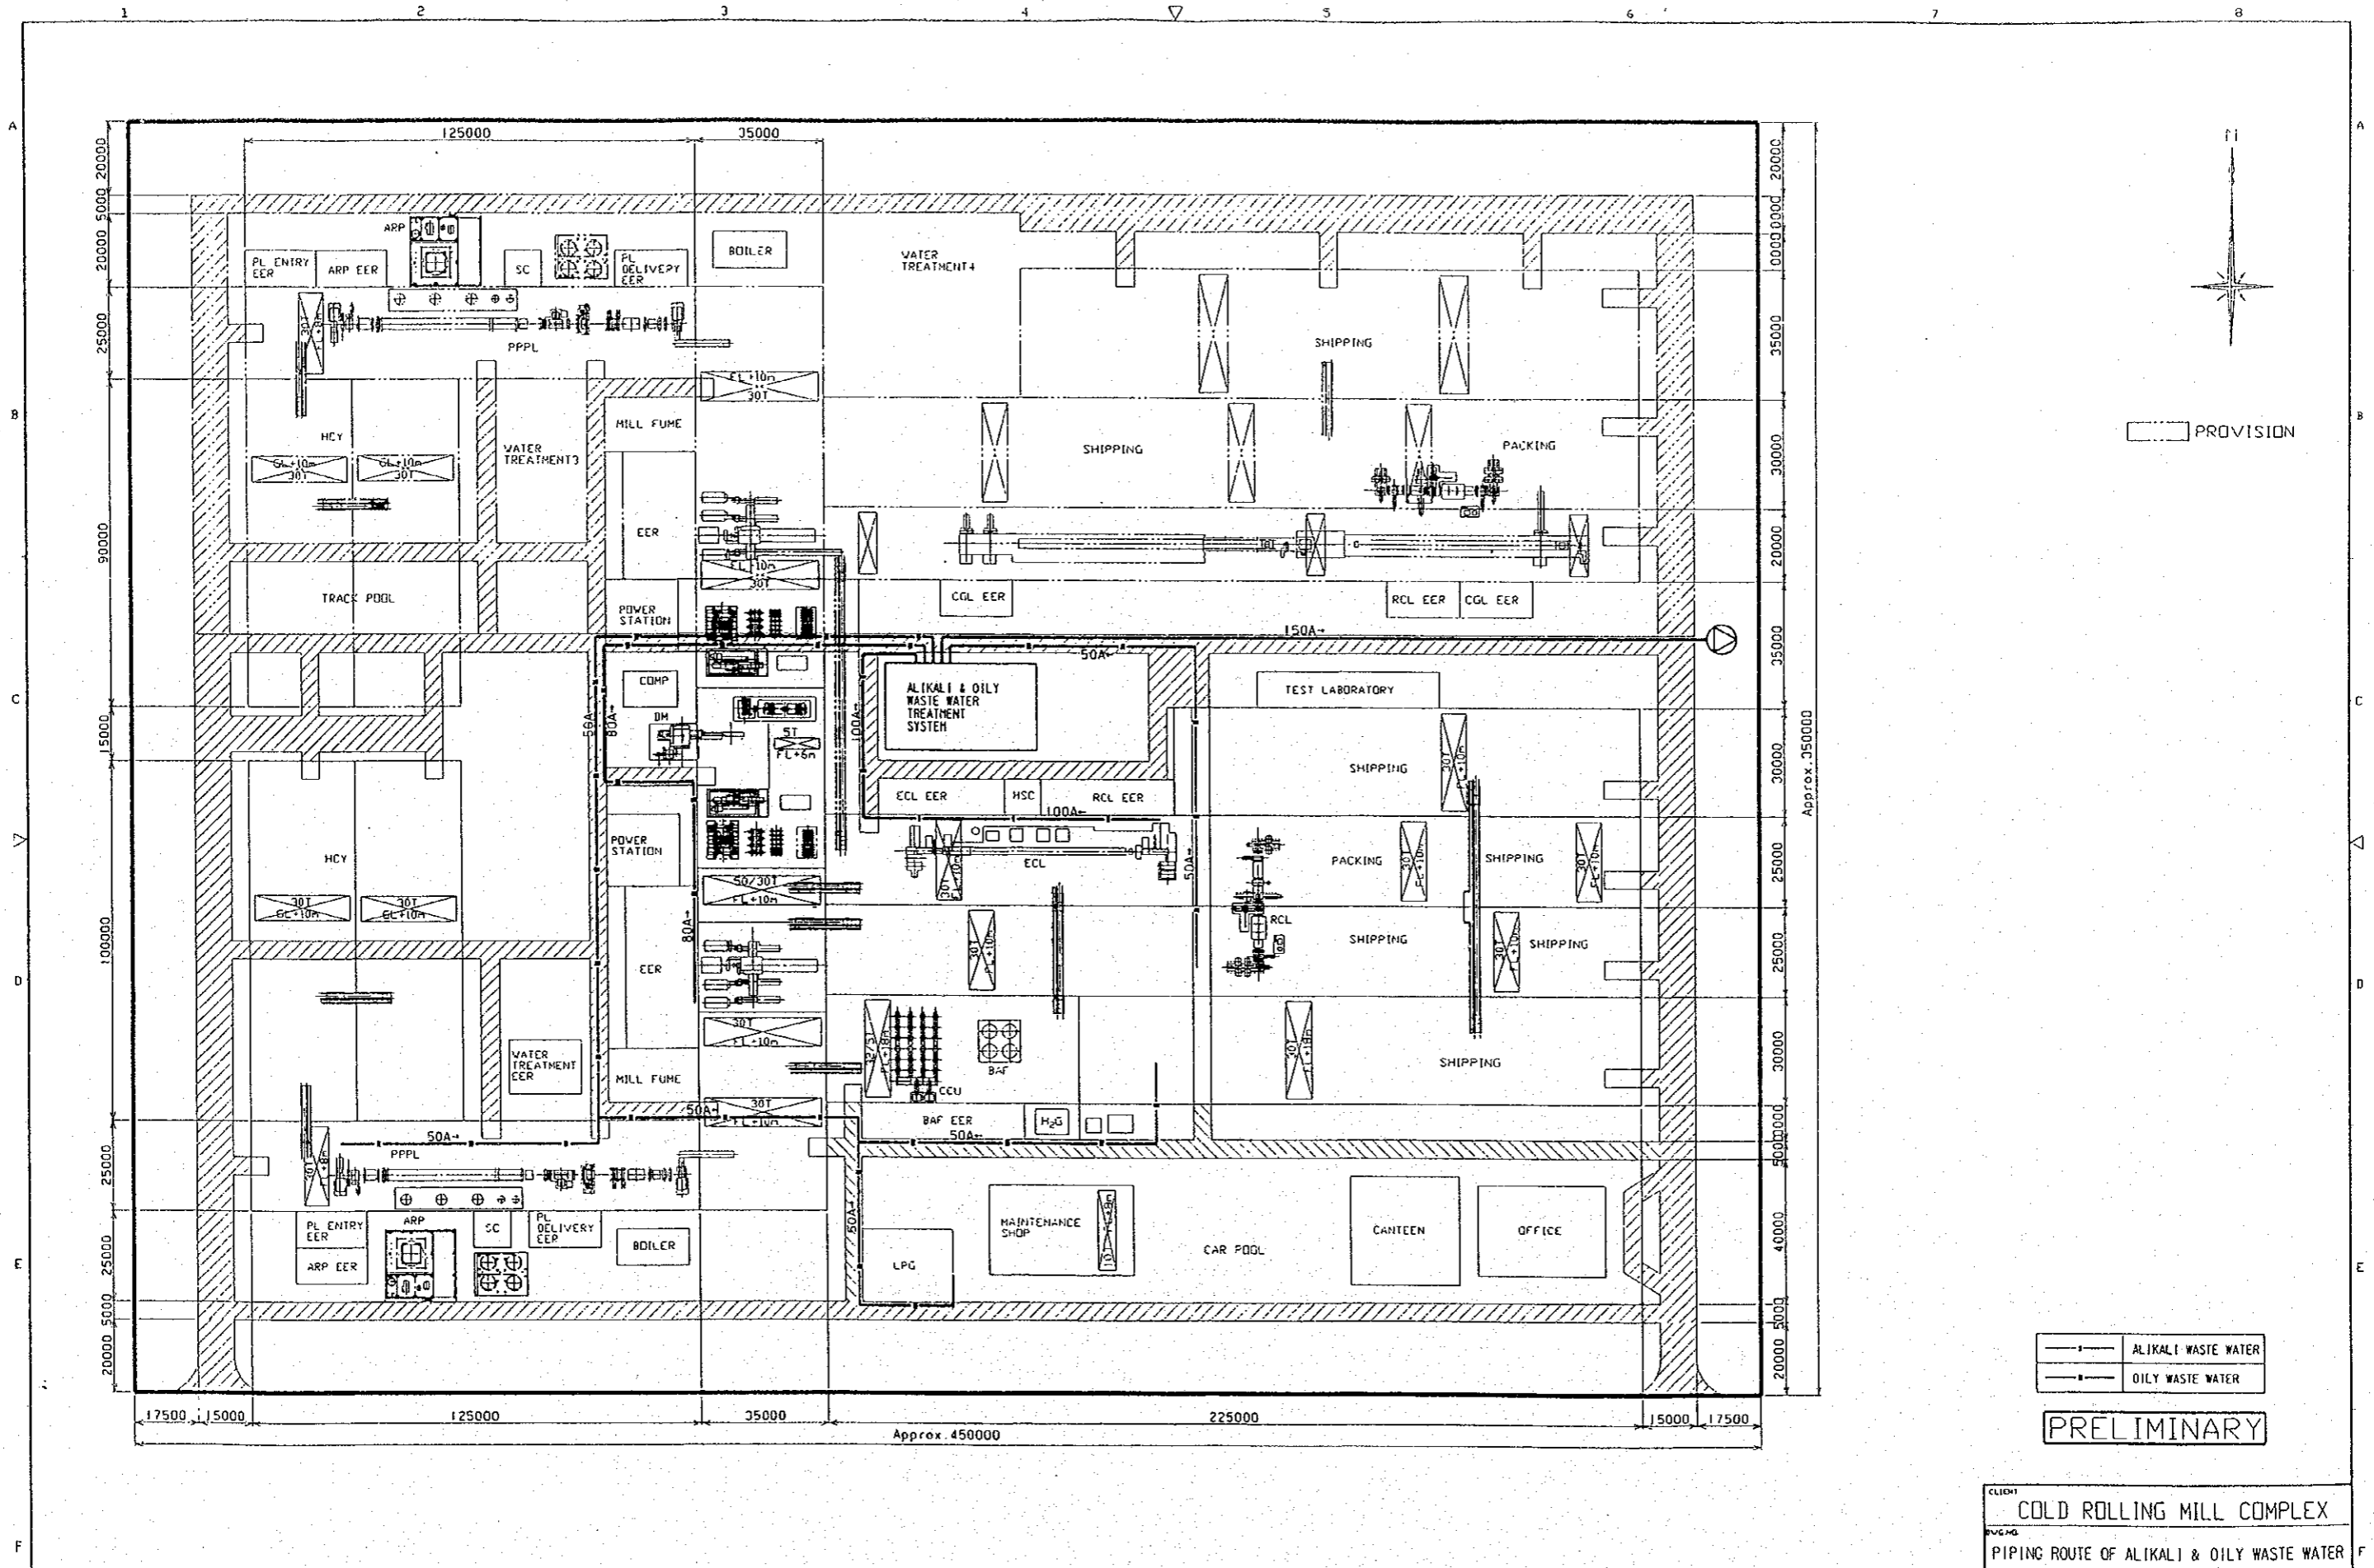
Piping Route Of Alkali & Oily Waste Water
